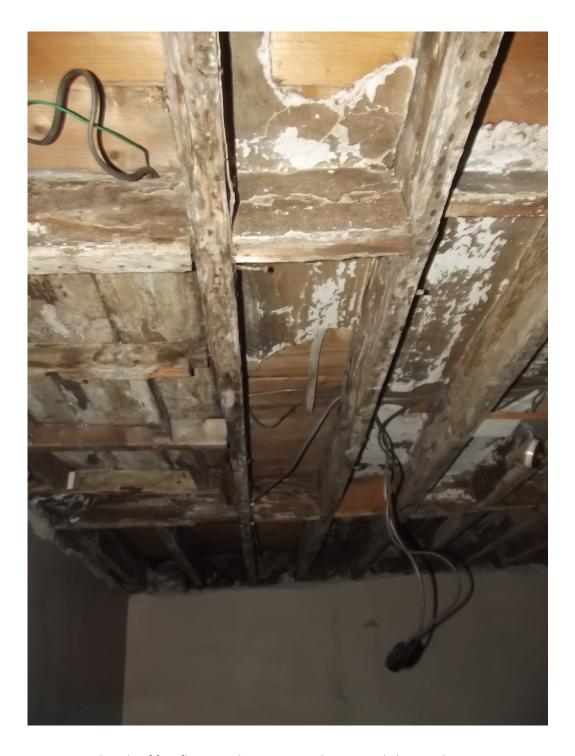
Underside of first floor, southeast corner, showing early limewash to joists.
